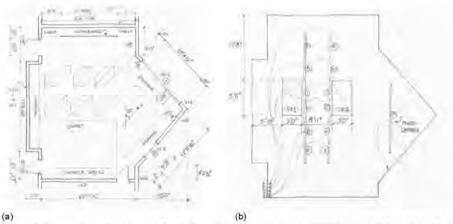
Example floor plan (a) and reflected floor plan (b) for a classroom [HMG report on surveys].
